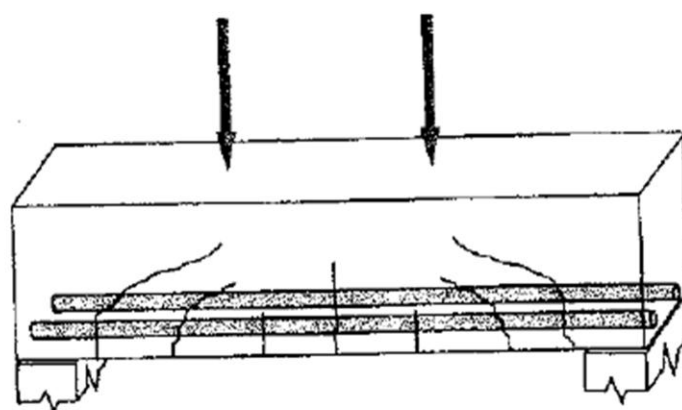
Shear cracks in beam with longitudinal reinforcement
